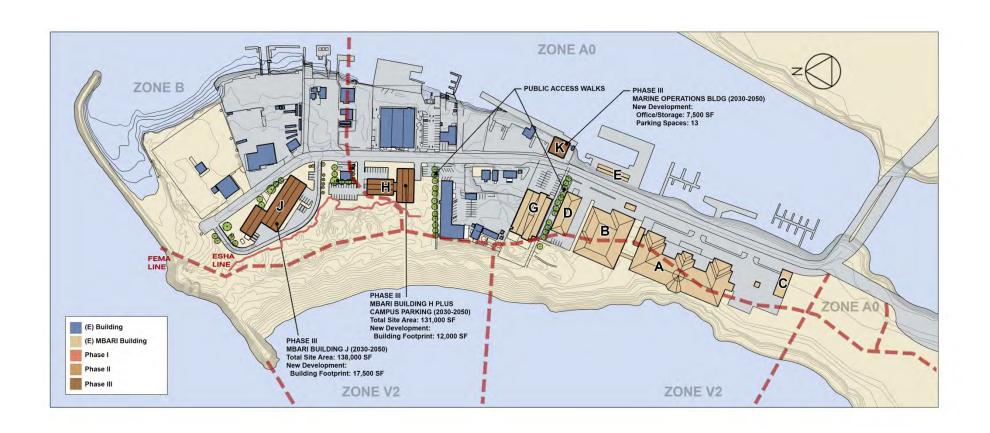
Site plan depicting MBARI's existing facilities.
